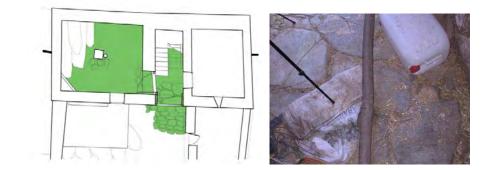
Material and construction system, timber frame walls type 3 and concrete walls
